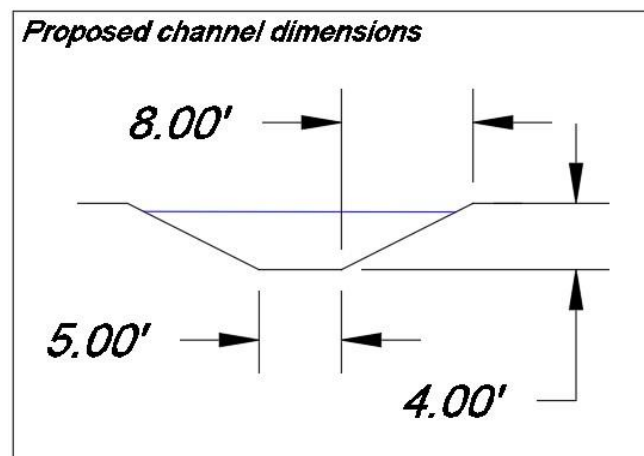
Proposed Channel Cross-Section Dimensions
